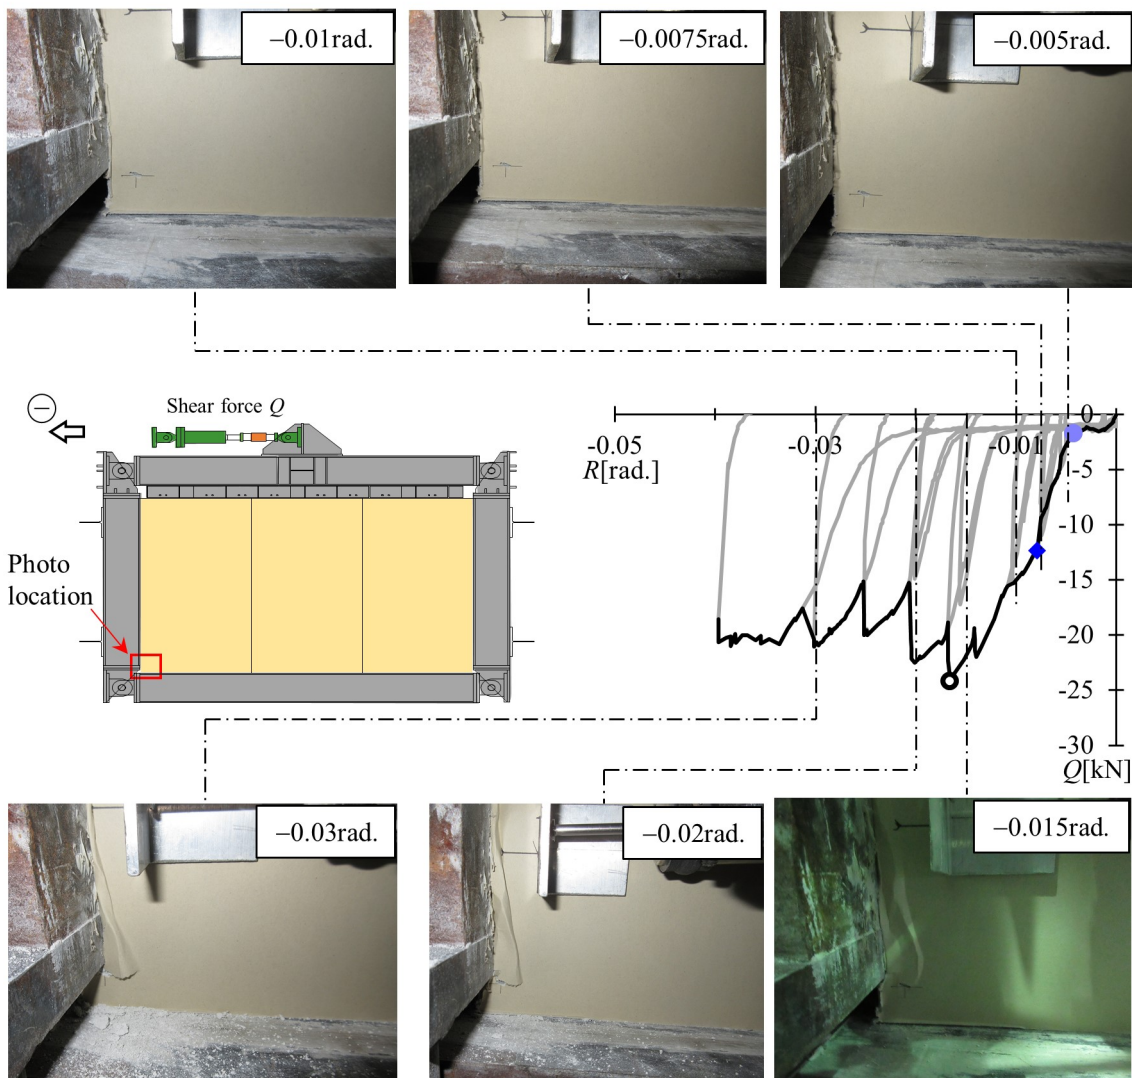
Damage to the gypsum board at loading cycle from 0.005 rad to 0.03 rad (Specimen S12.5\*2, lower left corner).
